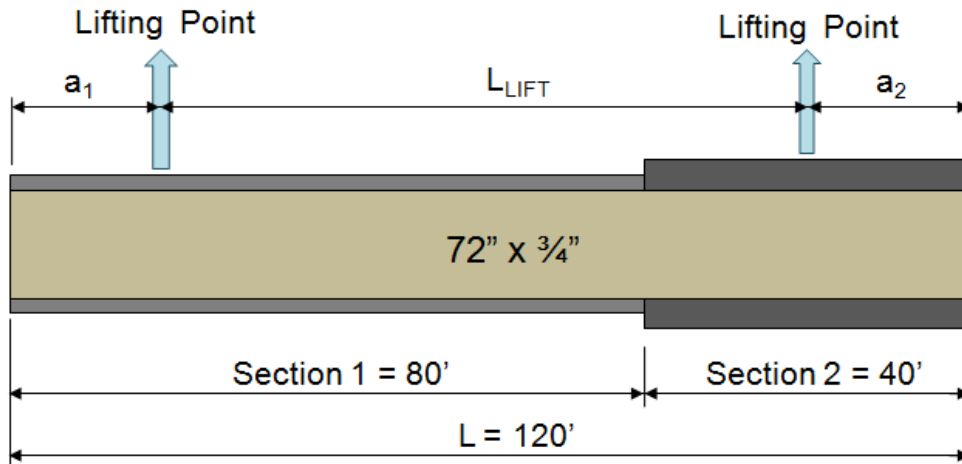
Two Cross Section Girder Schematic (80' - 40')
